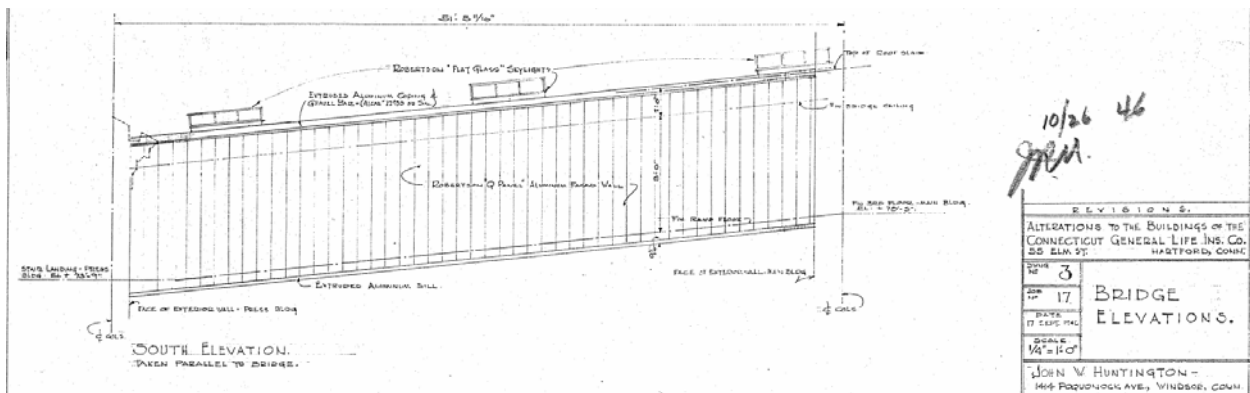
Plans titled “Alterations to the Buildings of the Connecticut General Life Insurance Co.”, by John W. Huntington, dated 13 Sept. 1946. This elevation depicts the bridge connecting the two buildings in plans found on the Hartford GIS Scanned Document Viewer. The drawings depict the bridge plans and details as well as other alteration to the annex building, referred to as the Press Building in the drawings.
